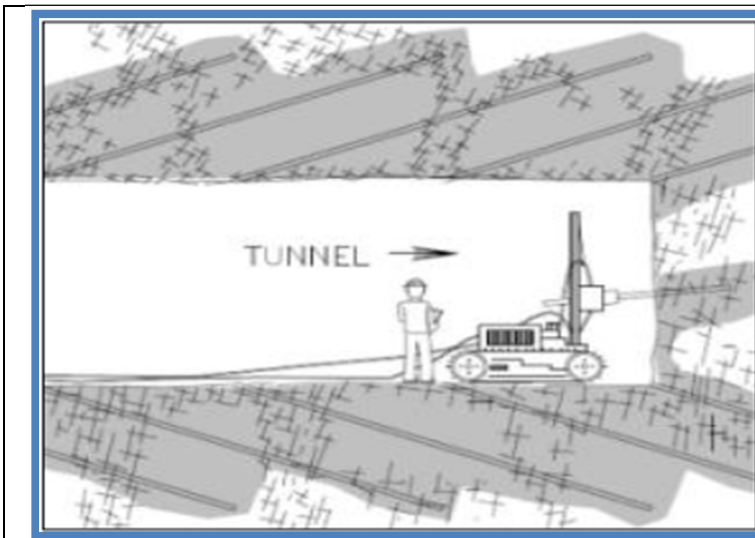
Pre-consolidation grouting ahead of tunnel excavation
